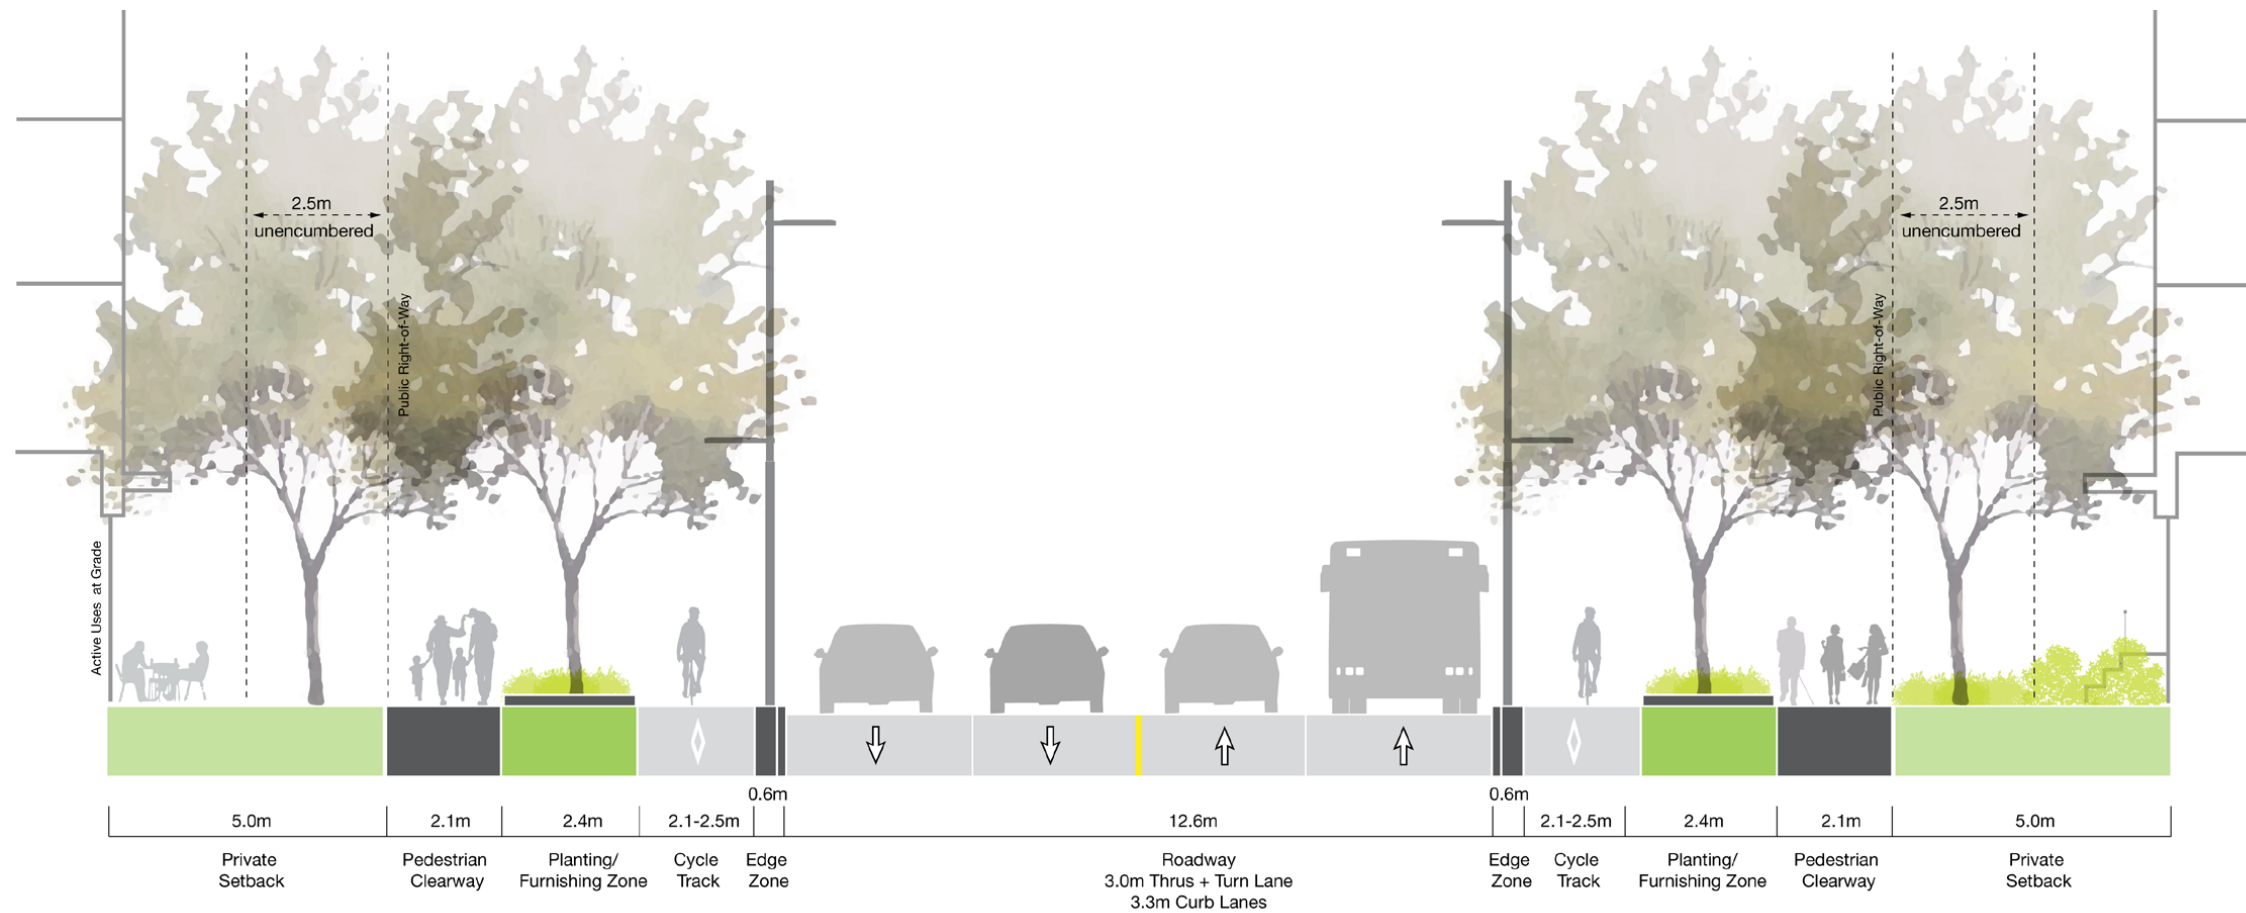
Progress Avenue East and West Leg Cross Section 27 m ROW
